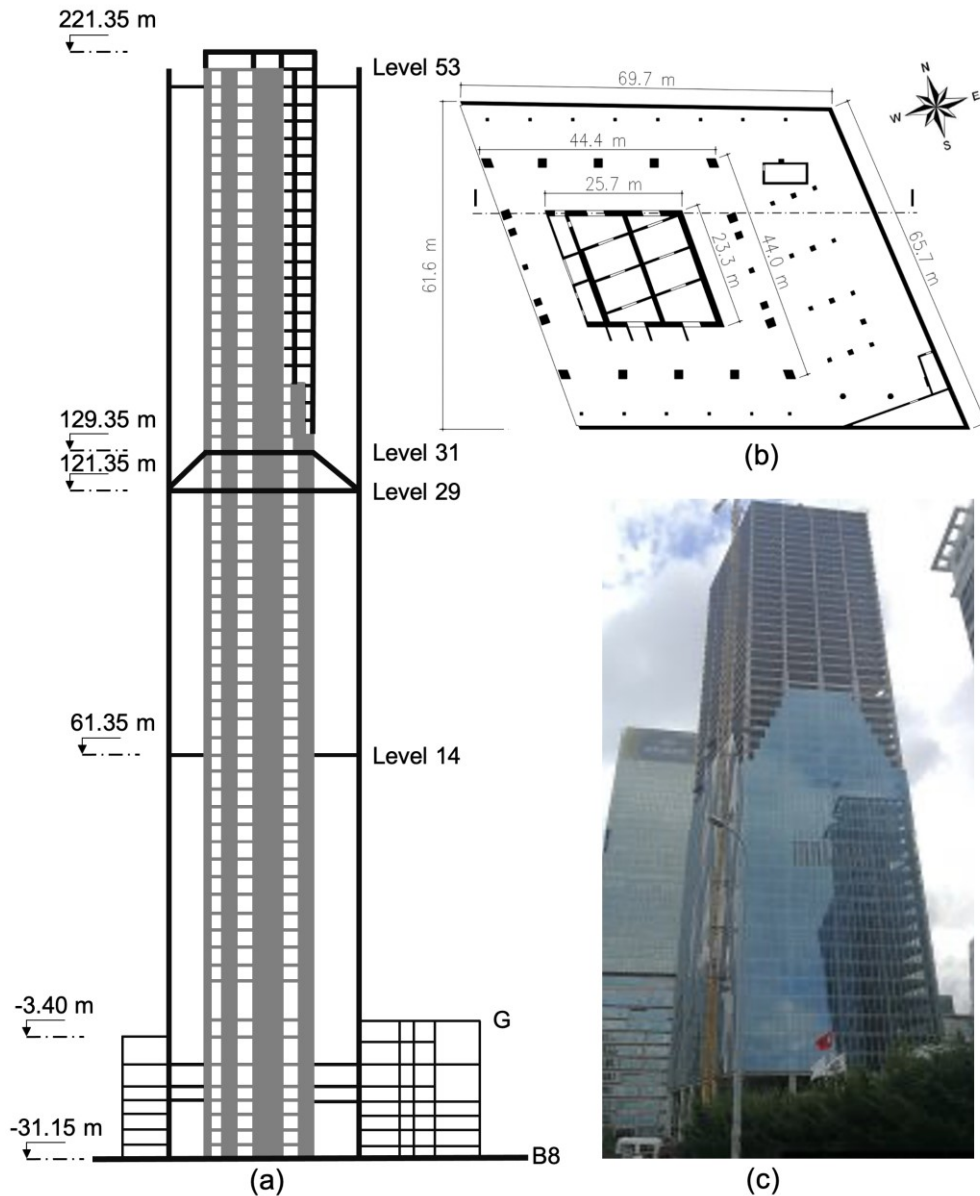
a Building section I-I, b typical podium floor plan and c construction view from the northeast corner
